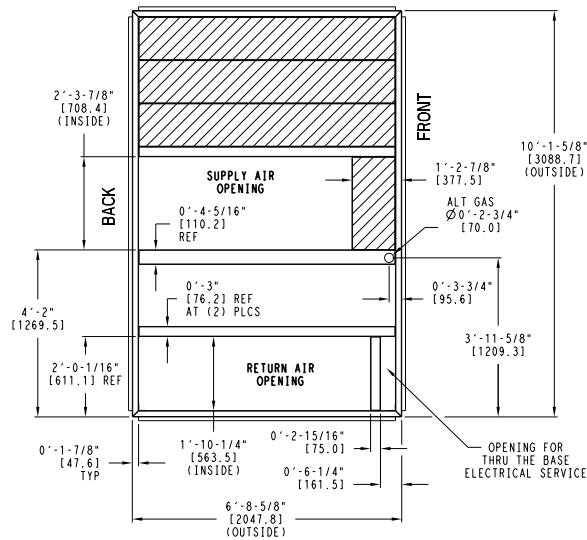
48FC30 Base Unit Dimensions (cont)
